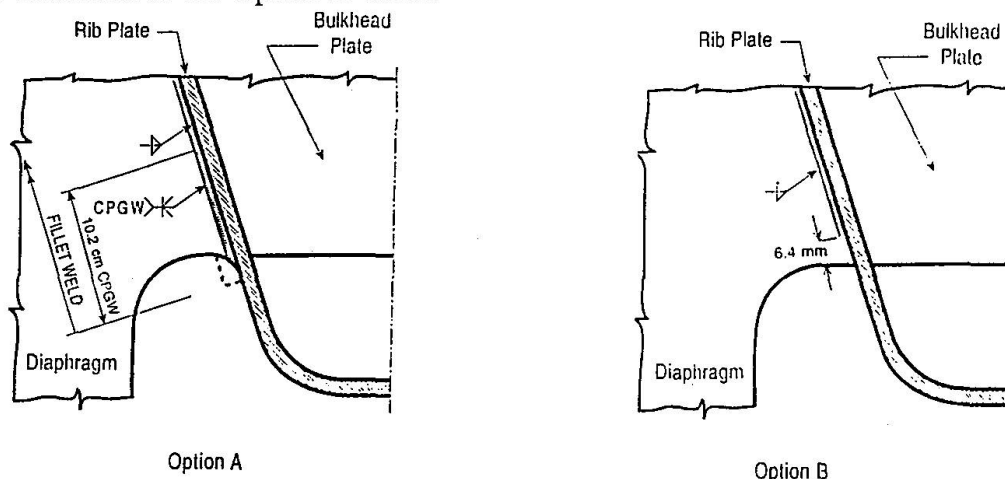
Alternative details for the termination of the weld in the diaphragm-to-rib connection
